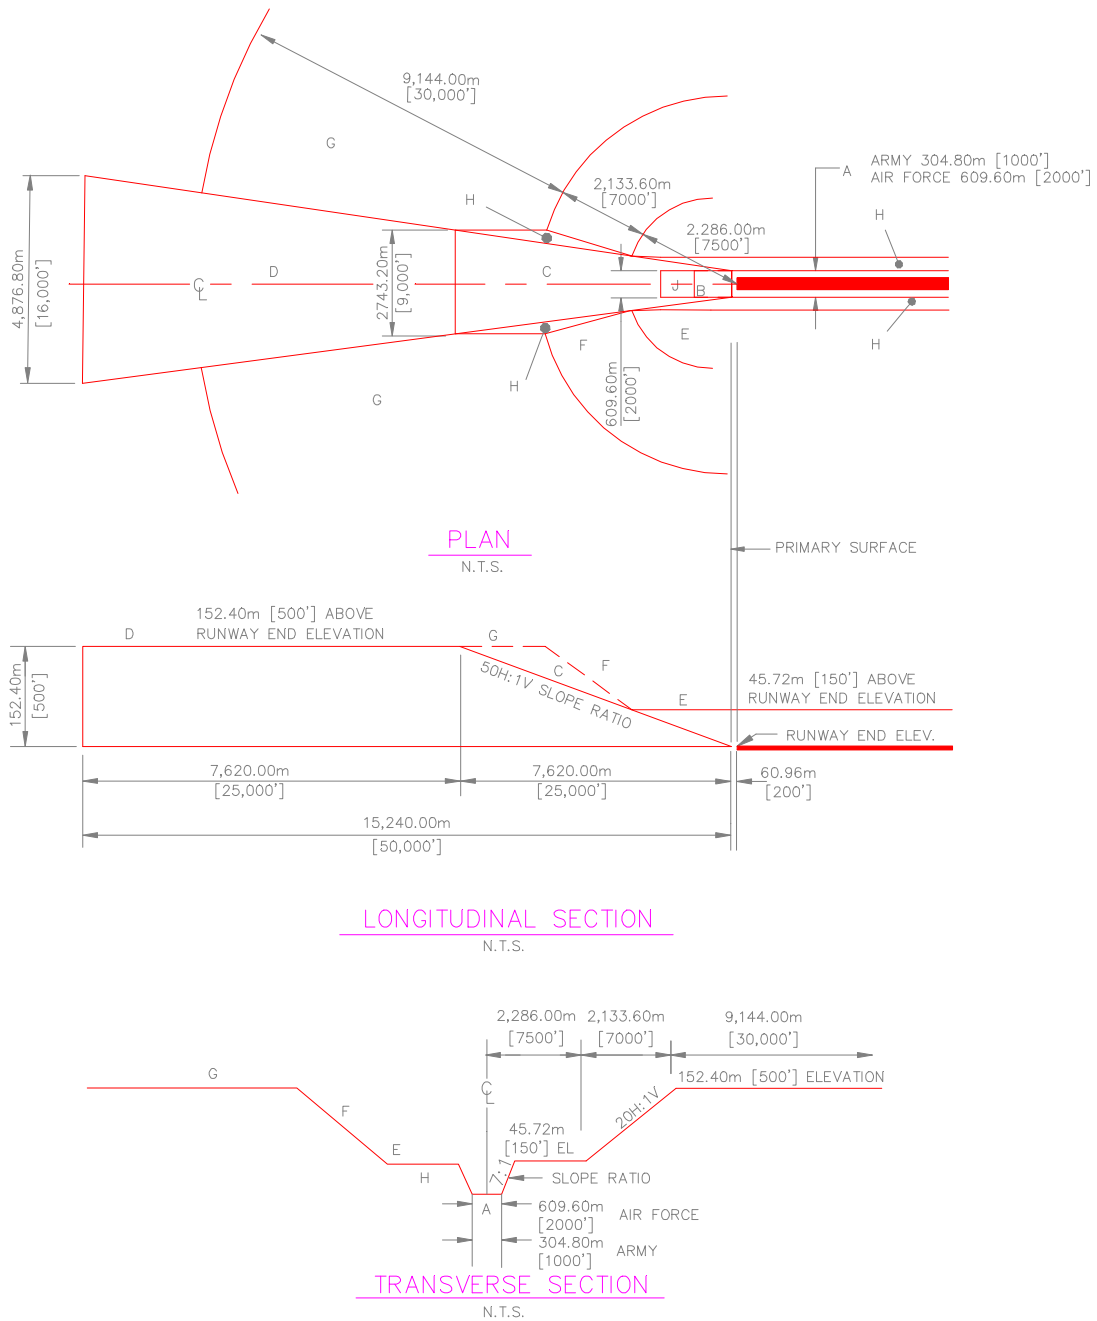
Class B Army and Air Force Runway Airspace Plan and Profile Runway Imaginary Surfaces.
